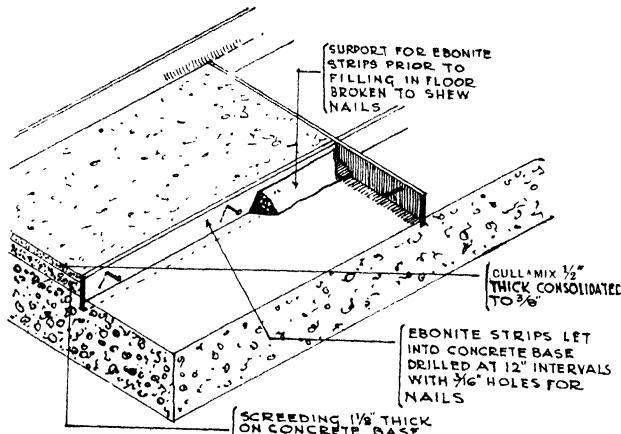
PREPARATION OF FLOOR FOR CULLAMIX
